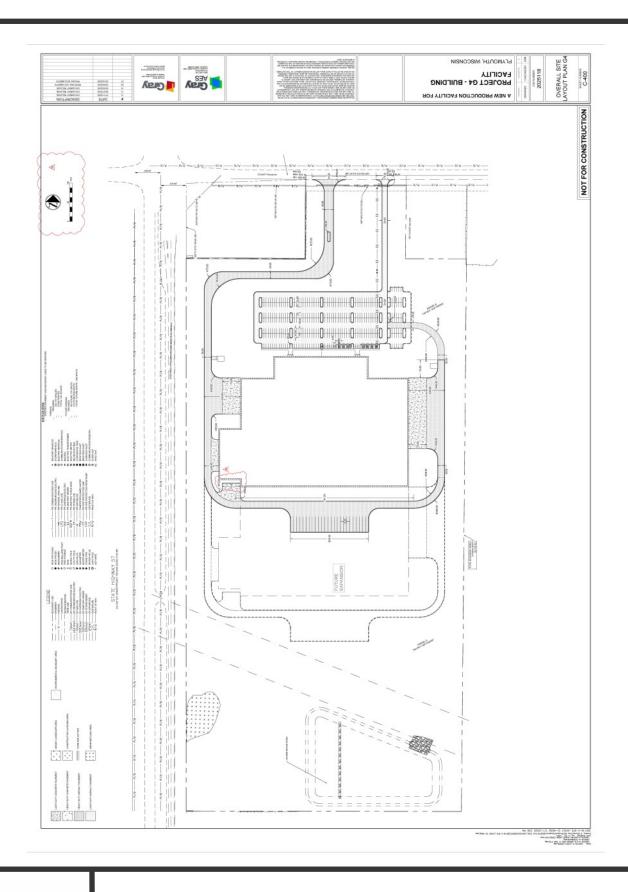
CONCEPTUAL SITE PLAN
